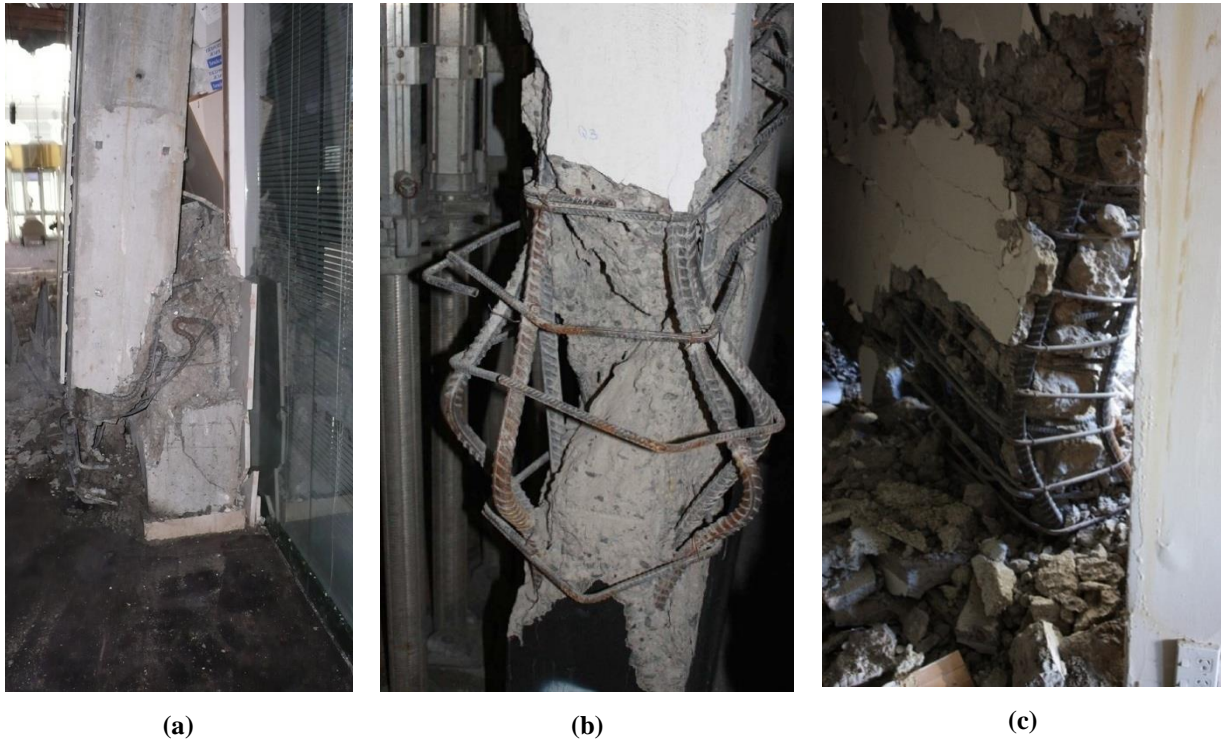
(a) Axial crushing failure of main load bearing wall, Christchurch (courtesy of Dunning Thornton Consulting), (b) crushing and reinforcement buckling of wall end region, Chile (Wallace, 2011), (c) out-of-plane buckling and crushing of perimeter wall, Christchurch (courtesy of Rick Henry).
